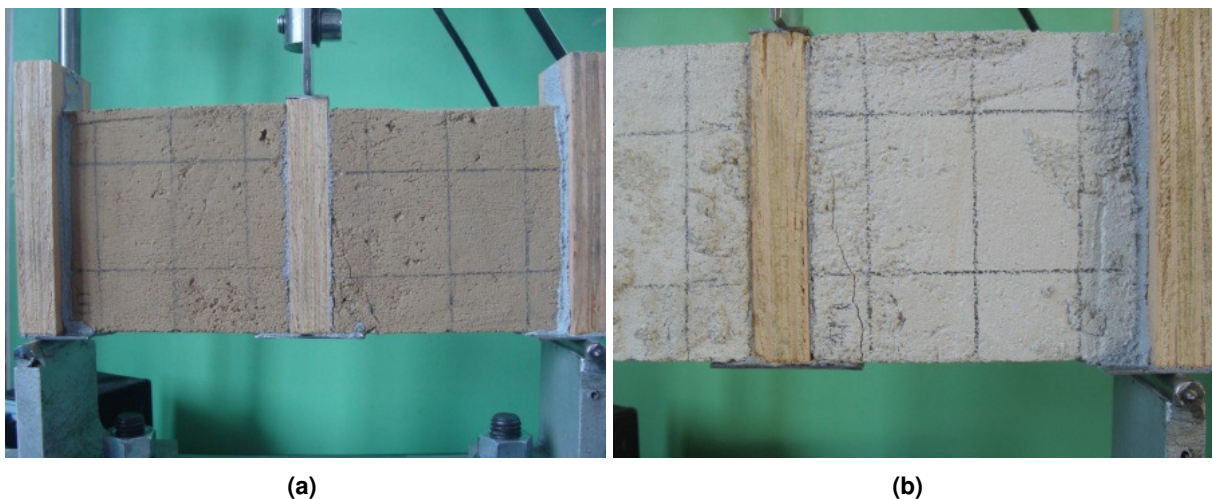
Tested reinforced mortar specimens under shear load: clay mortar specimen (a) and detail of crack in lime mortar specimen (b).
